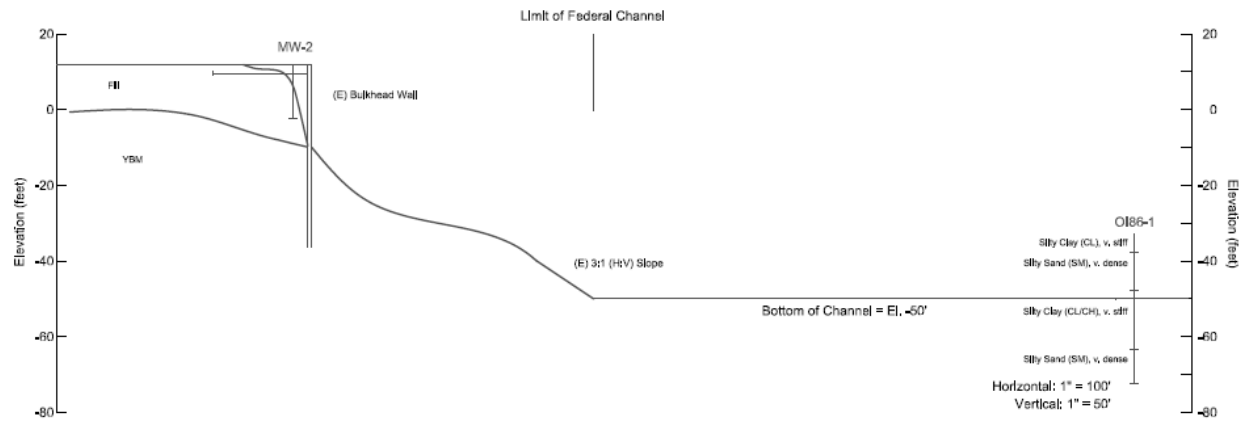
Schnitzer Steel Cross-Section C-C'(Existing)
